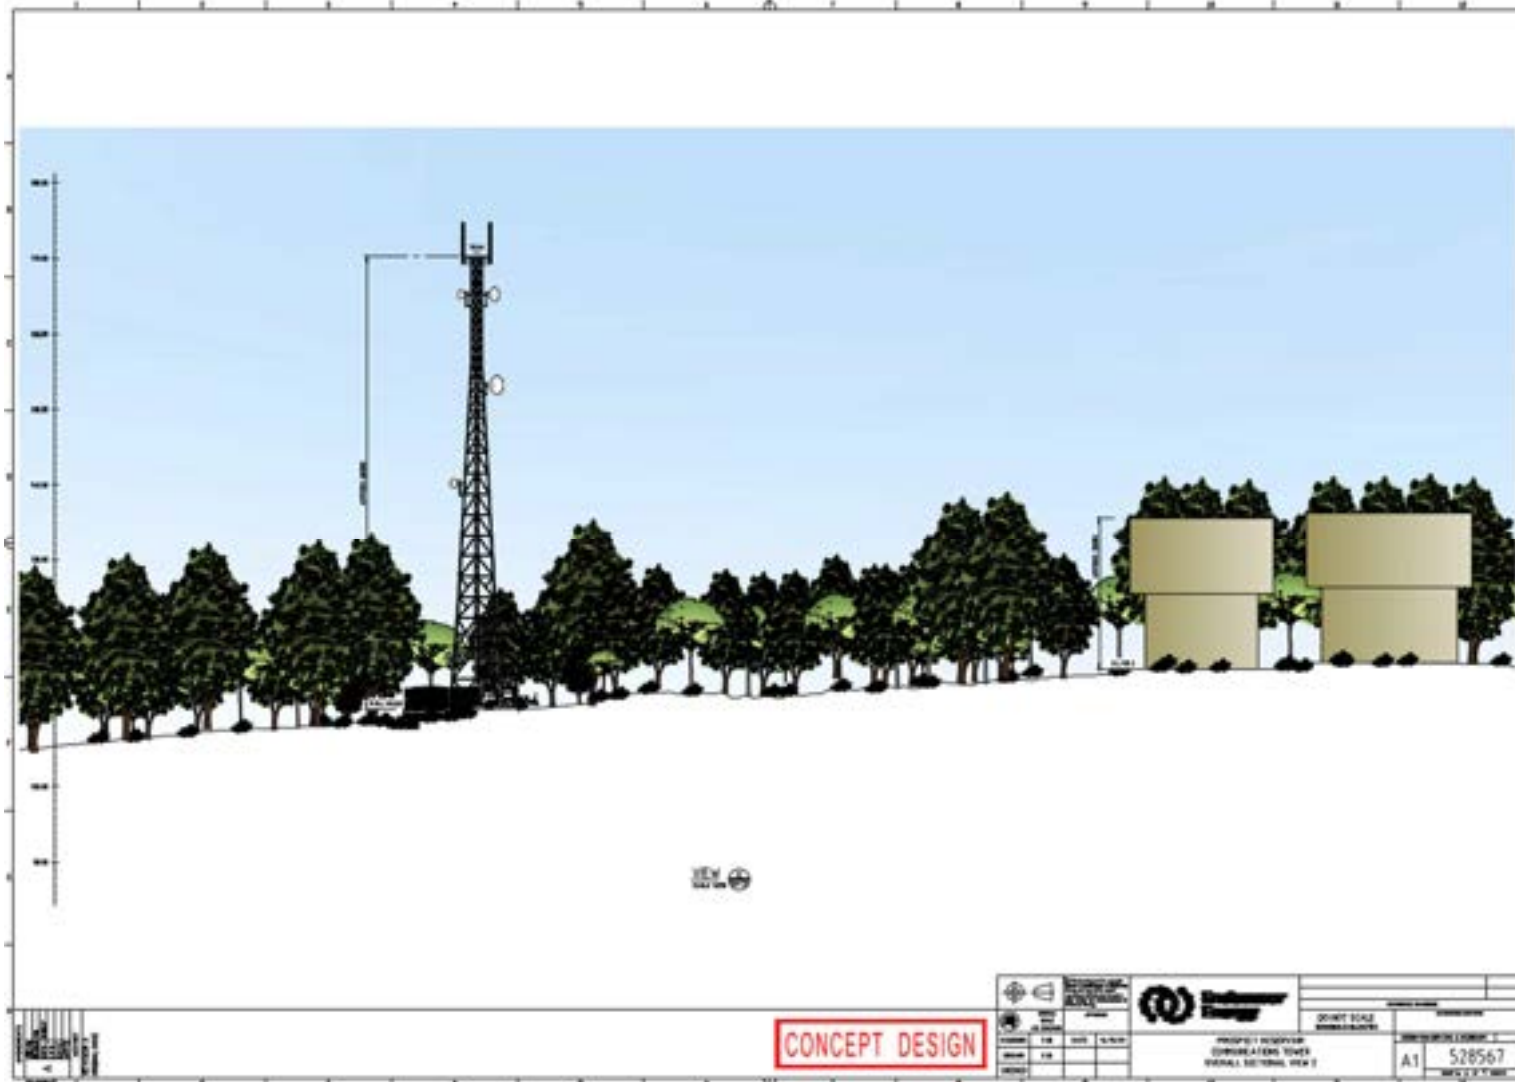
Section showing proposed tower and existing water towers (refer Figure 3 for section location)
